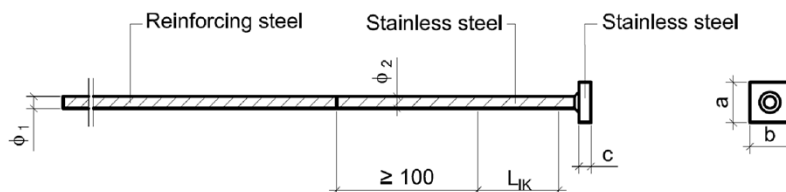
Steel compression element with welded-on compression plate and welded reinforcing steel
